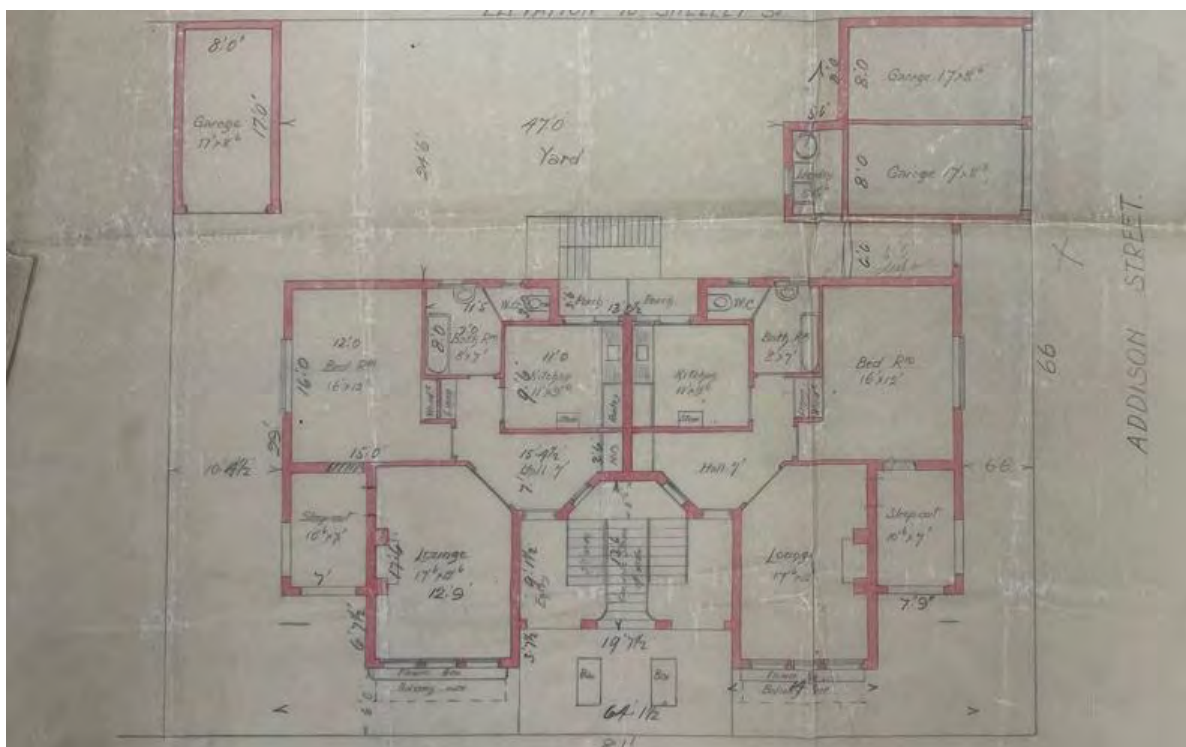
Proposed brick flats, Addison Street and Shelley Street, Elwood for F. Watson Esq (plan). Source: E. Jennings & Sons. 1930. Drawings of 59 Shelley Street, Elwood. Council Records. City of Port Phillip.
